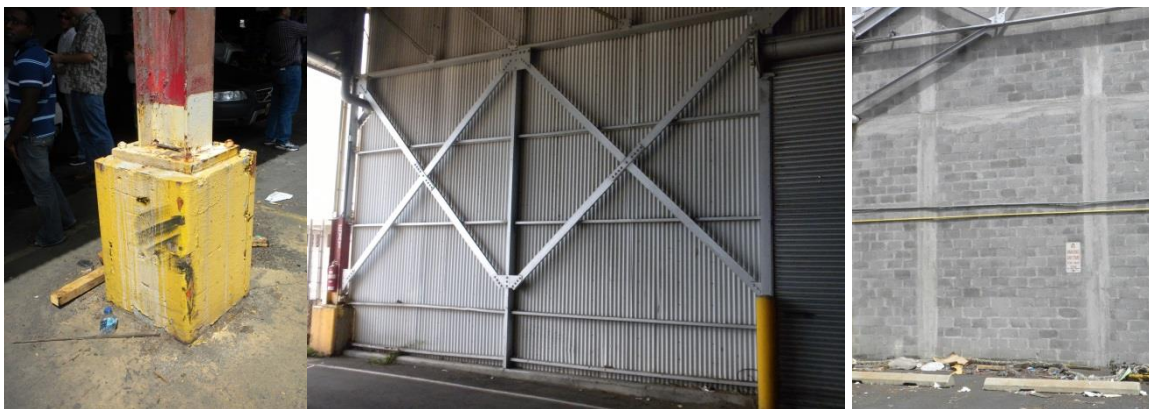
Details of framing members in warehouse on Piers 31 to 33
